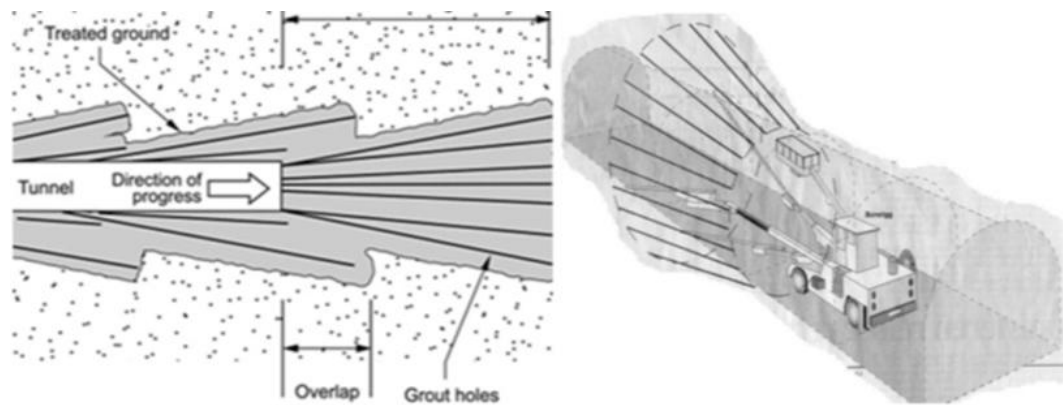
Illustration of pre-grouting in tunnel (drawing by author).
